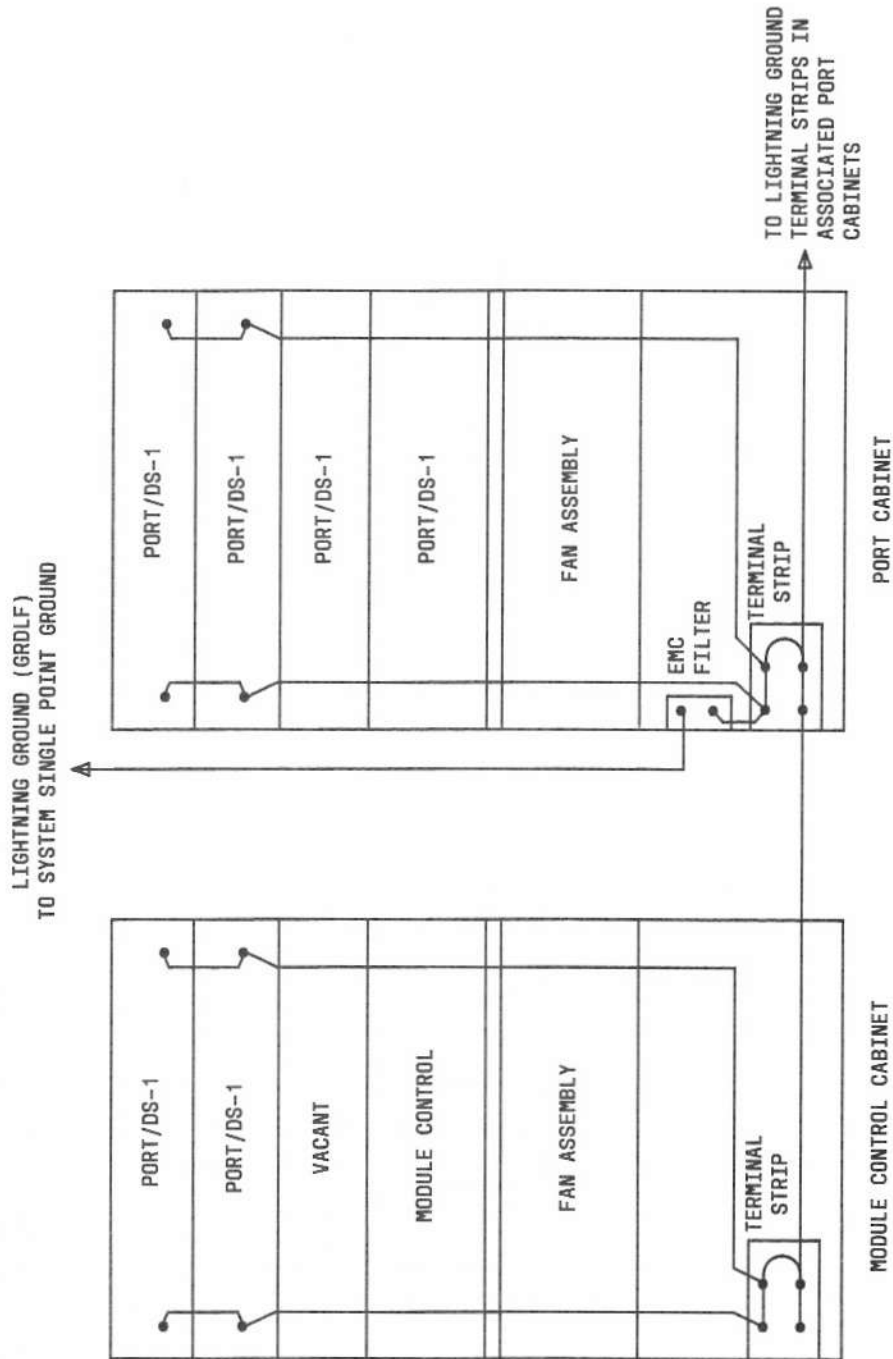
Typical Arrangement for Lightning Ground in AC-Powered System
